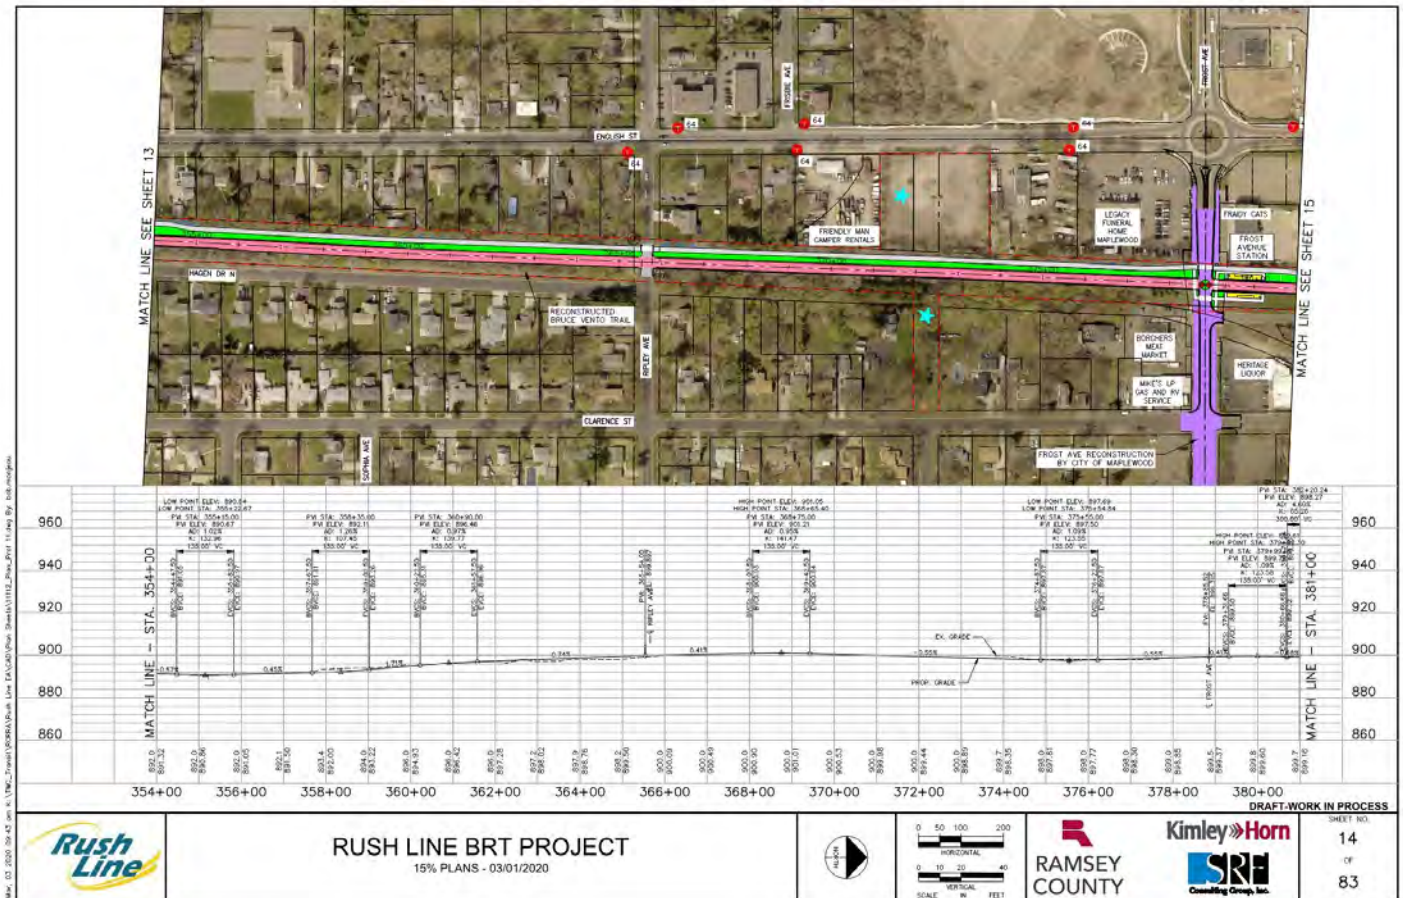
Sample Sheet from the Rush Line BRT 15% Plans Near the Frost Avenue Station Illustrating the Existing and Reconstructed Bruce Vento Trail
